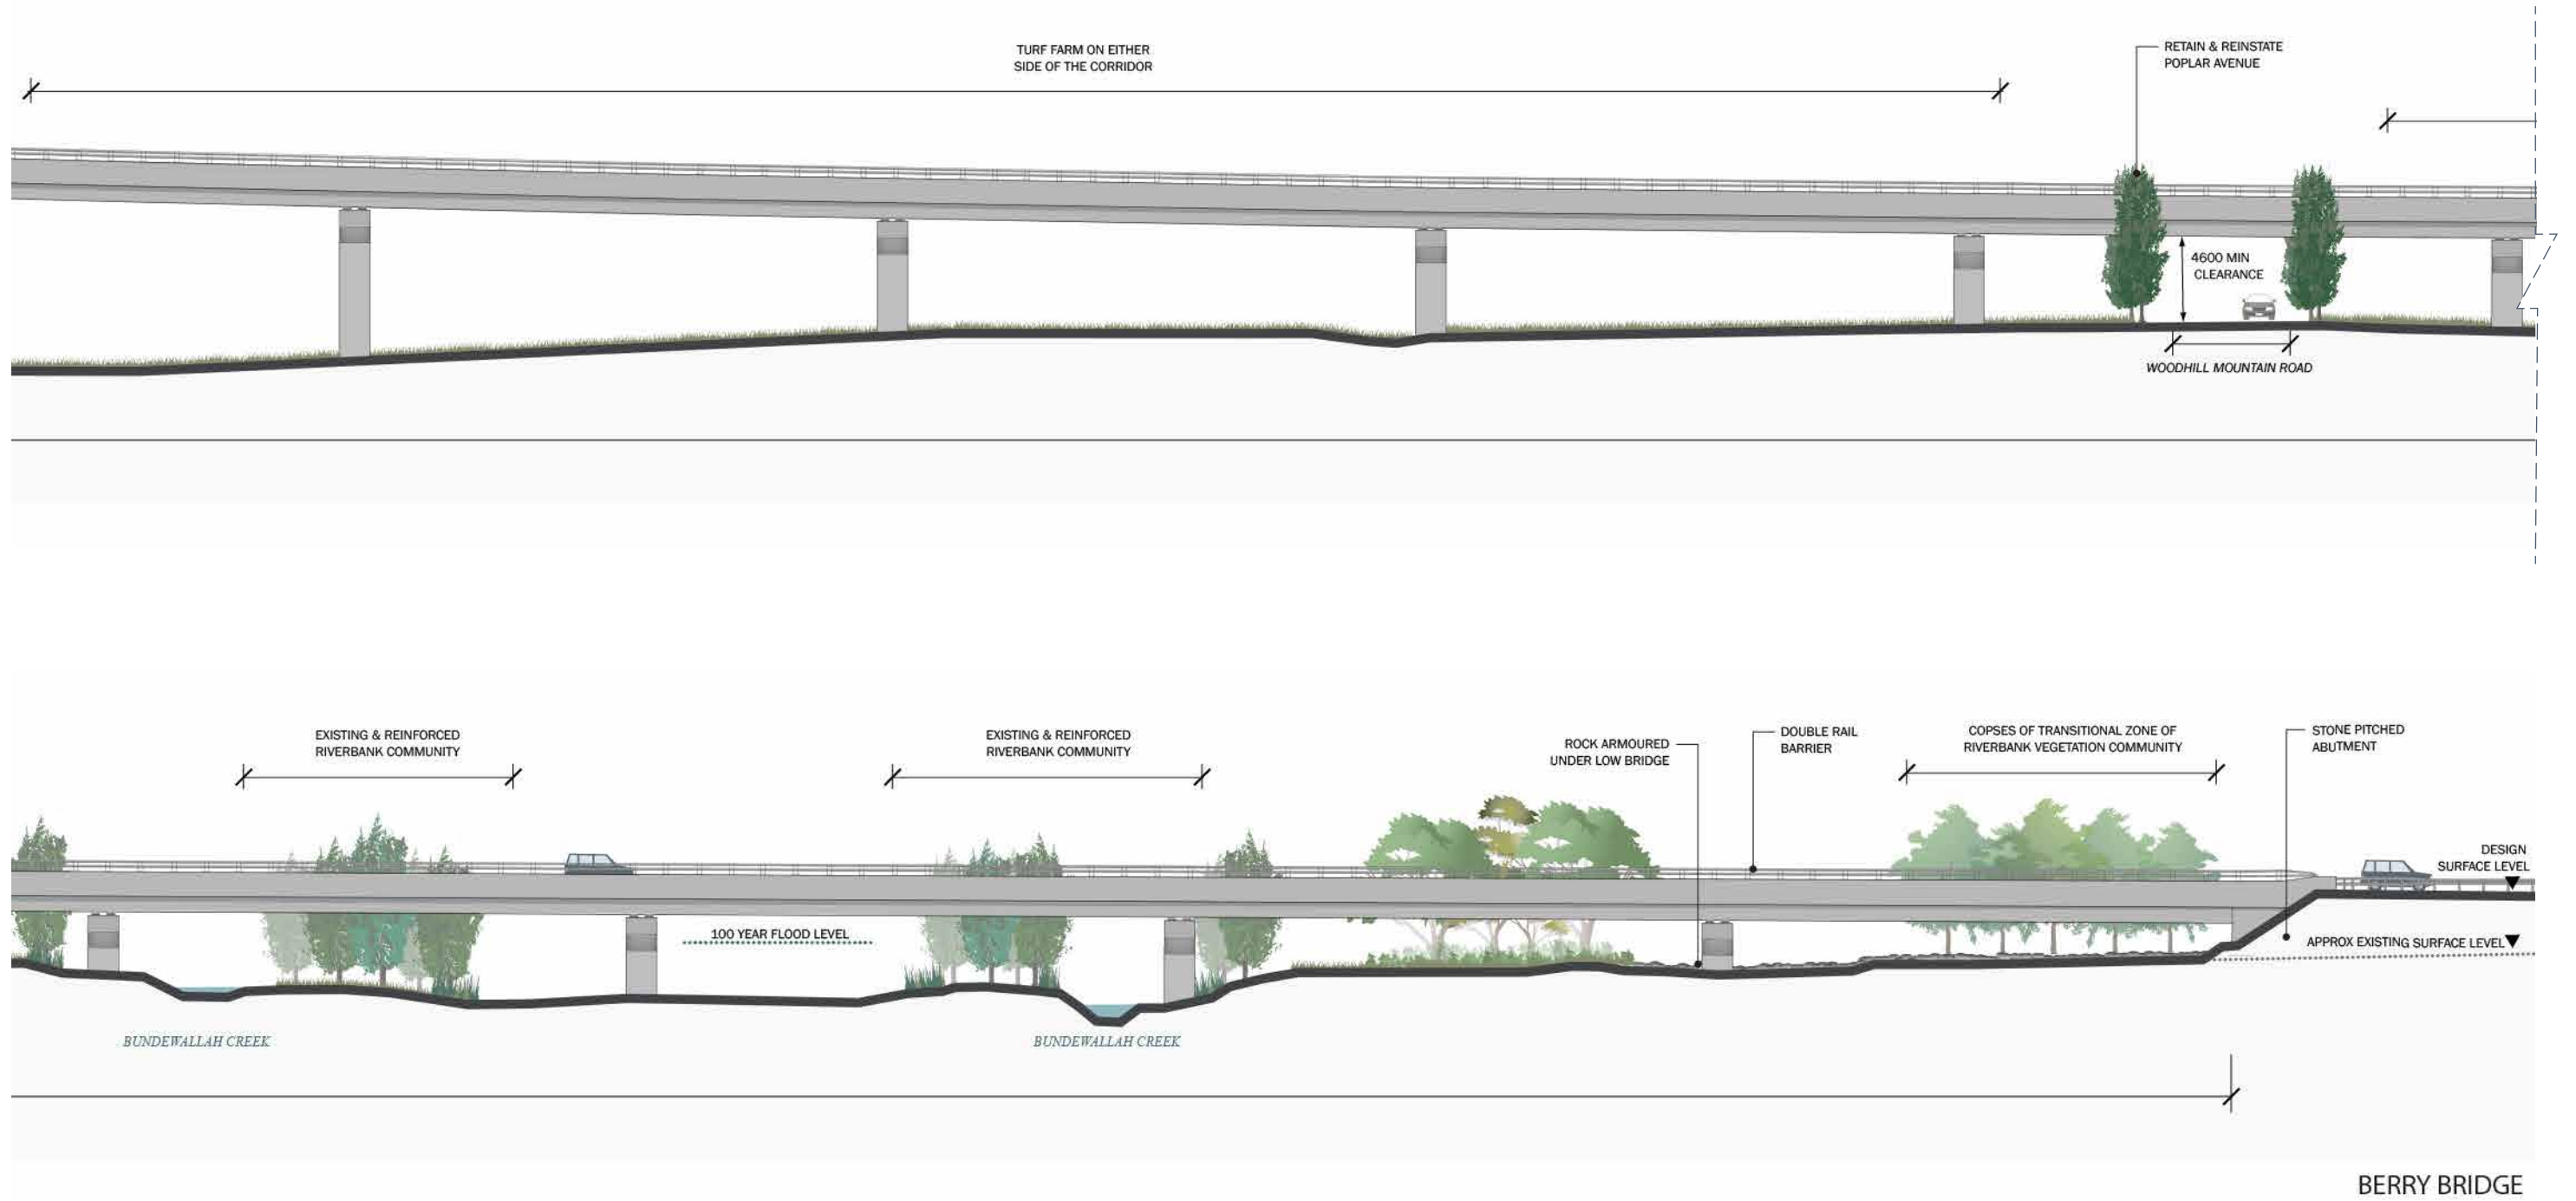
Elevation – Bridge SB07: Berry Bridge (cont.)
